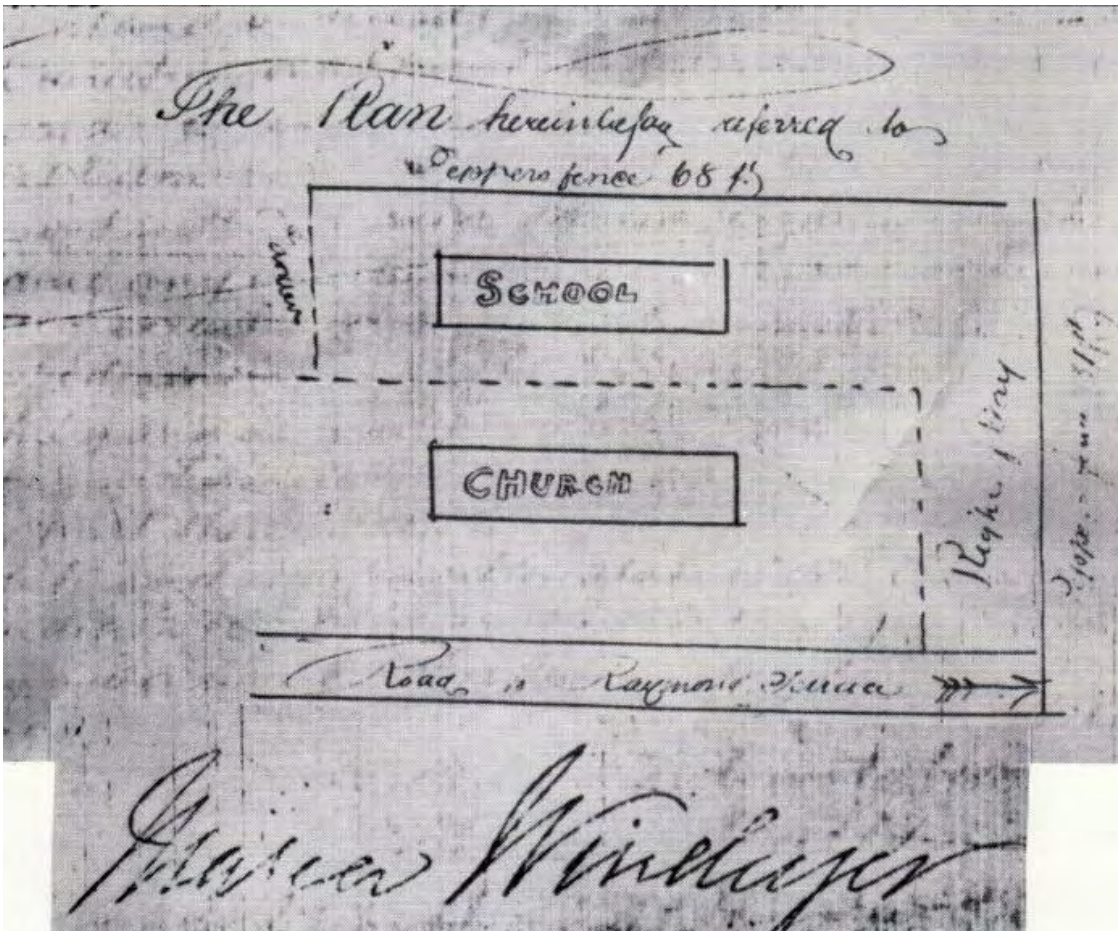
Plan showing location of school and church on Windeyer property, 1851.
